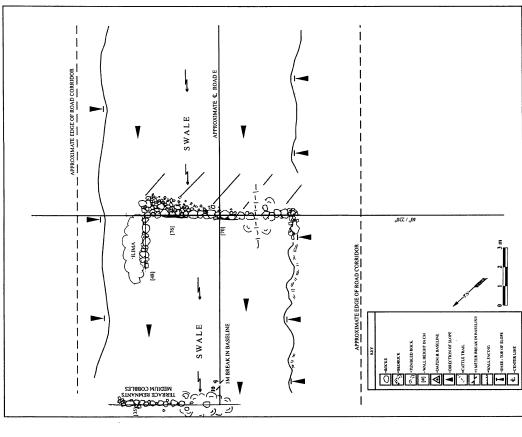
Road E, Site -3263, Feature L-1 Plan View Map.
